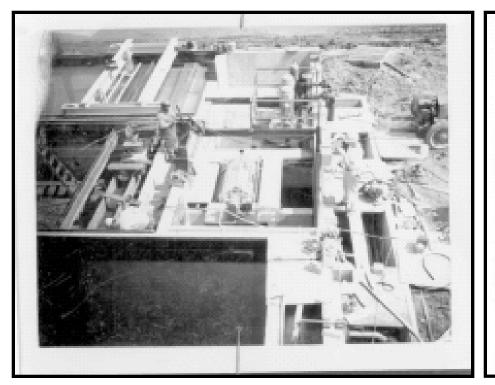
Undated photo. View looking north from WWTP roof at new Microscreen installation. Pipe trench is present along east side of tanks and is partially covered and north settling basin is full.
